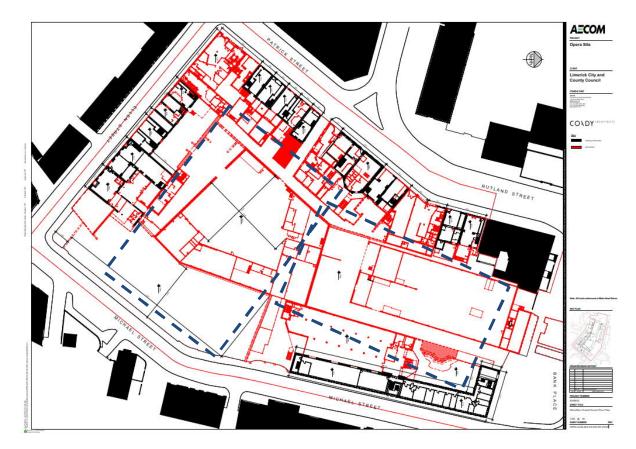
Existing Site Plan with proposed demolition in red, indicative areas for construction compounds in blue and building which will be subject to work in the enabling stage as black outlines.
